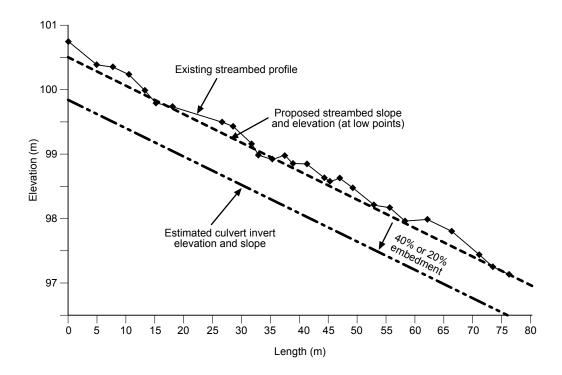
Stream elevation profile example for use in determining culvert slope and minimum invert level for an embedded culvert.
